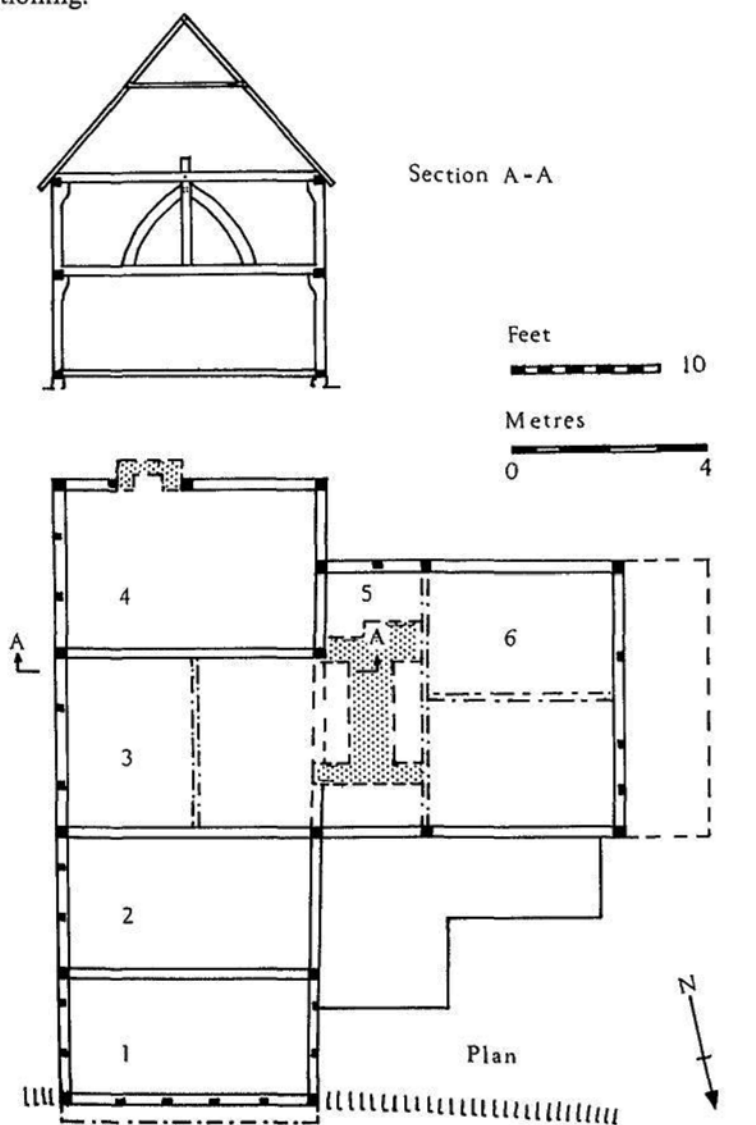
Plan and Section (looking South) through Bay 3 (A-A).
